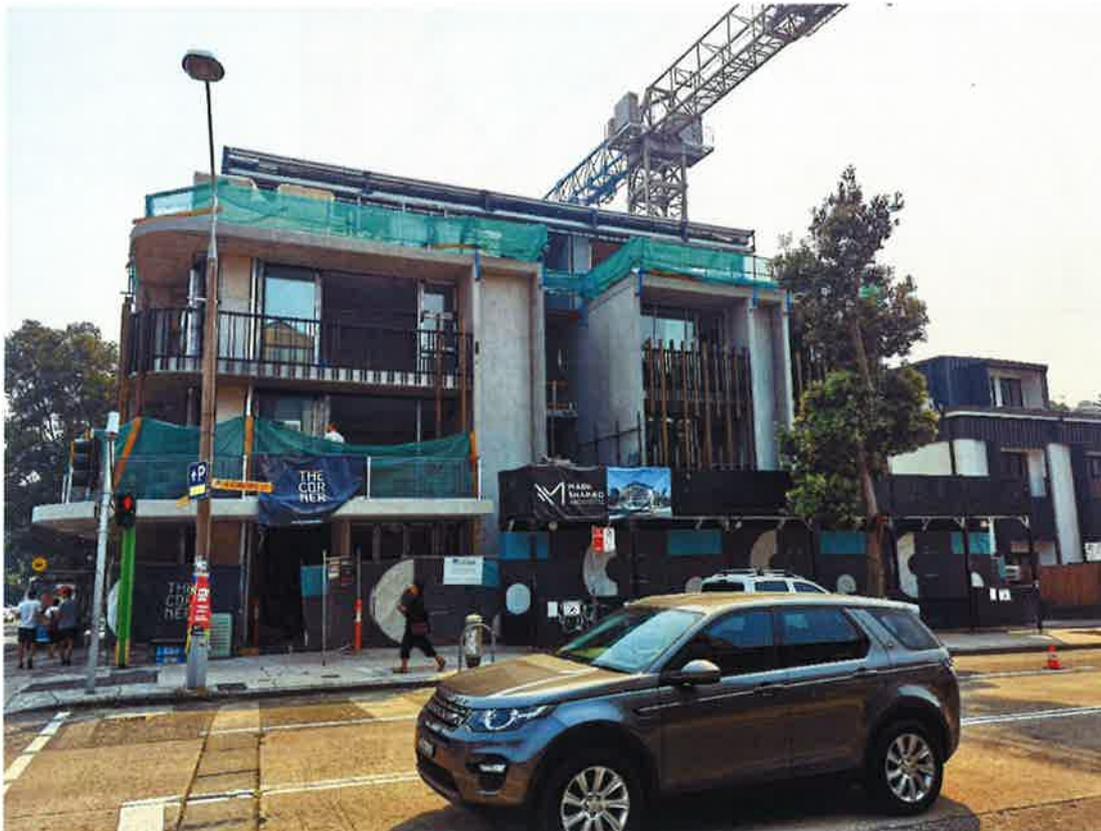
Mixed use development under construction on the subject site (left) and neighbouring two-storey residential building on Curlewis Street
